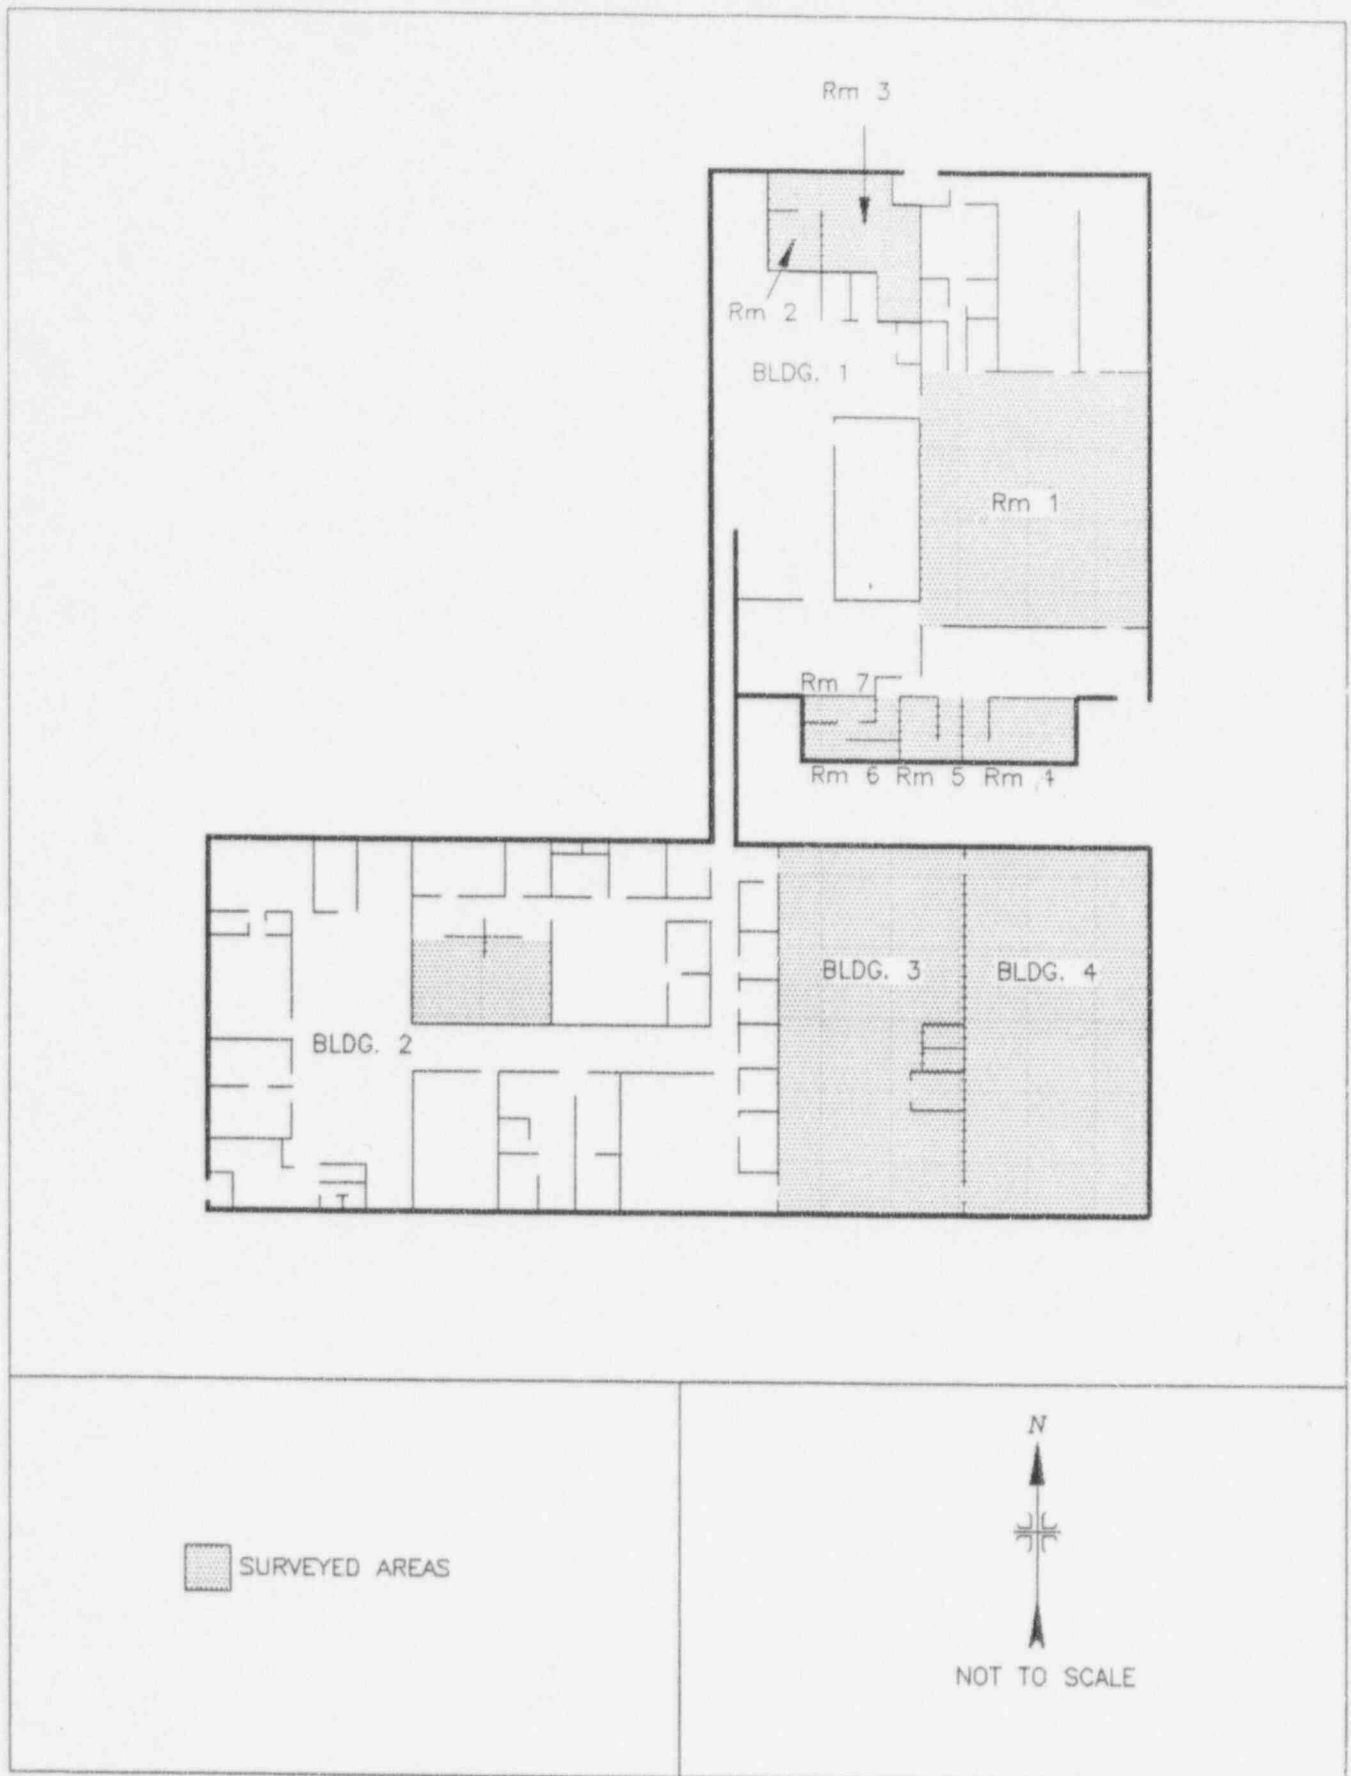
Dosimeter Corporation of America – Floor Plan and Surveyed Areas
